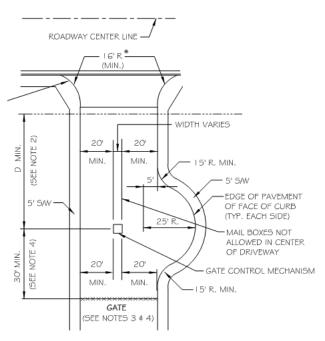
Town of Gilbert Gated Entrance Standard Detail
